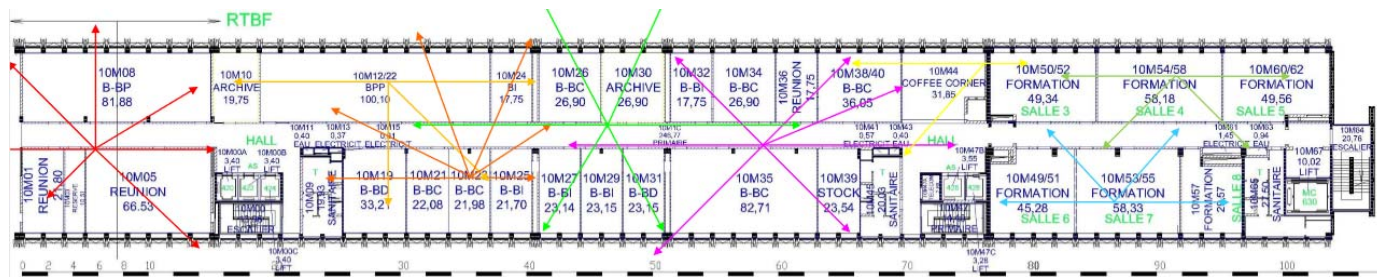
Design at 5 GHz for Floor 10 in Building CHJM
